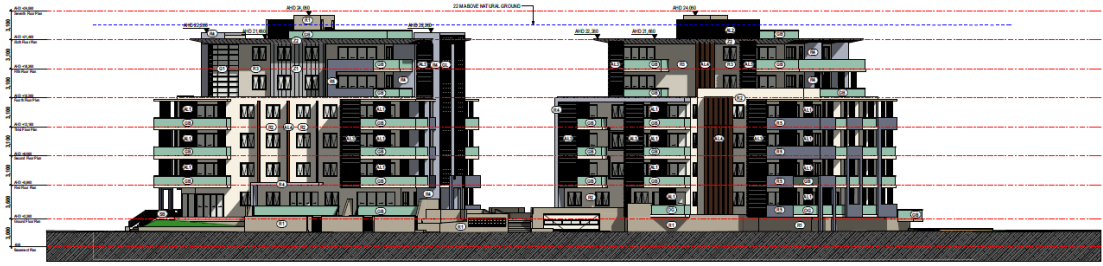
B: Proposed building heights in relation to 22m Building Height Limit under the LMLEP2014 for Blocks C and D
